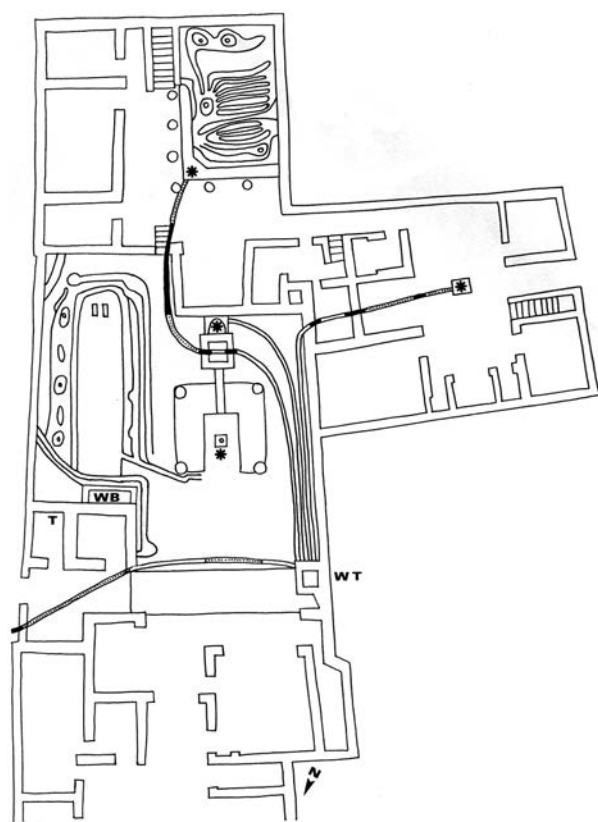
House of the Ephebe, 1.7.11, Pompeii, plan. On the plan, gardens and waters system indicated as follows: black line = water pipe in situ, dotted line = water pipe located with metal detector, open line = presumed water pipe or seen by the excavator, * = fountain, WT = water tower, WB = water basin, T = toilet.
